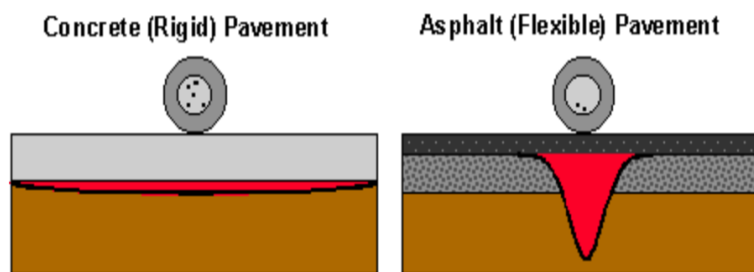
Typical Load Transfer PCC (Concrete Pavement) & AC (Asphalt) Pavement (ACPA)
